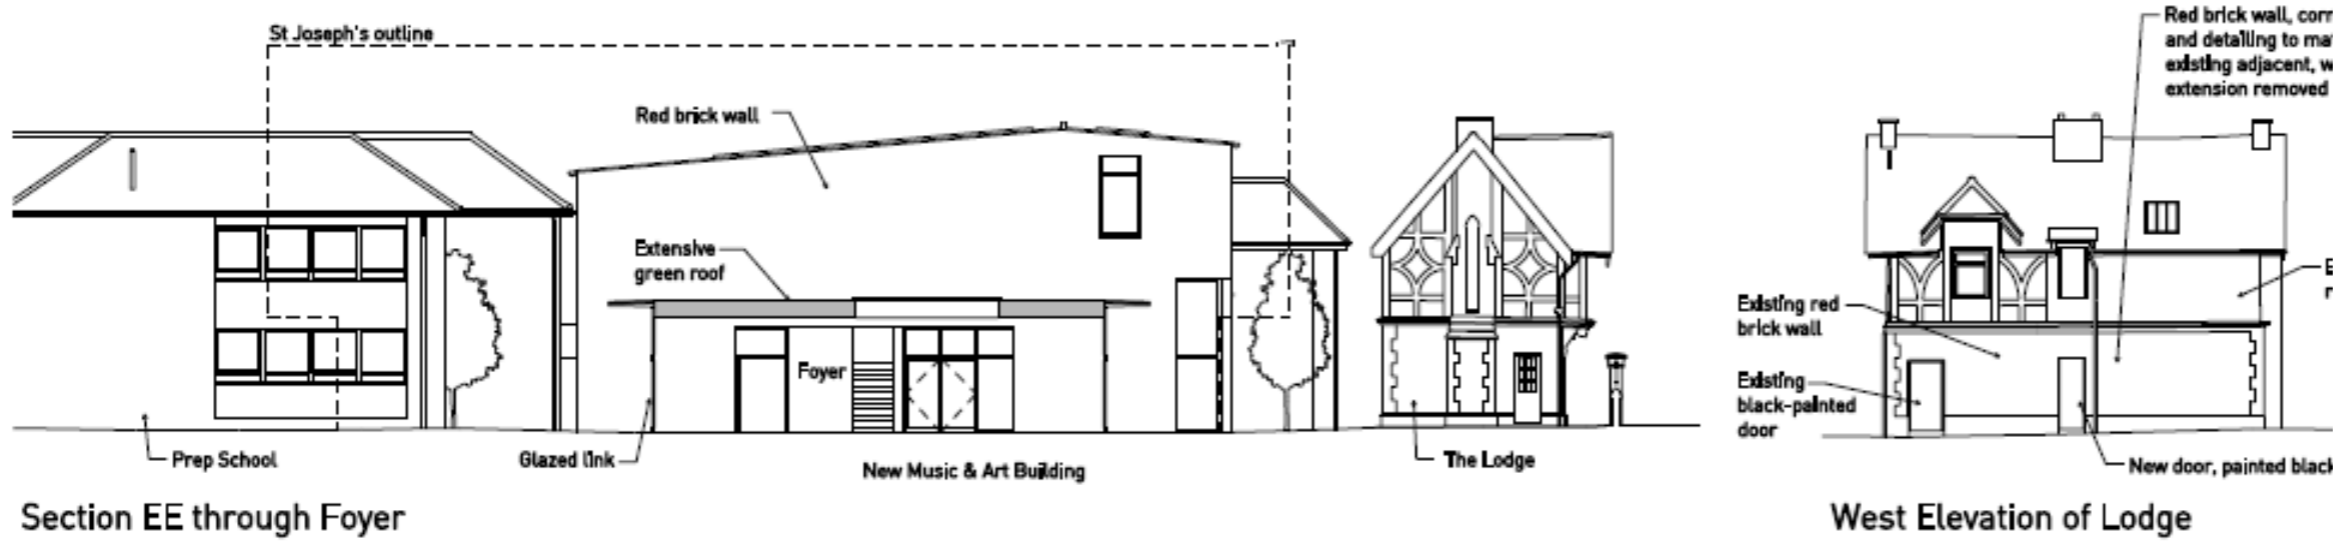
New Proposed Section EE and West Elevation of Lodge (Source: Tim Ronalds Architects)
